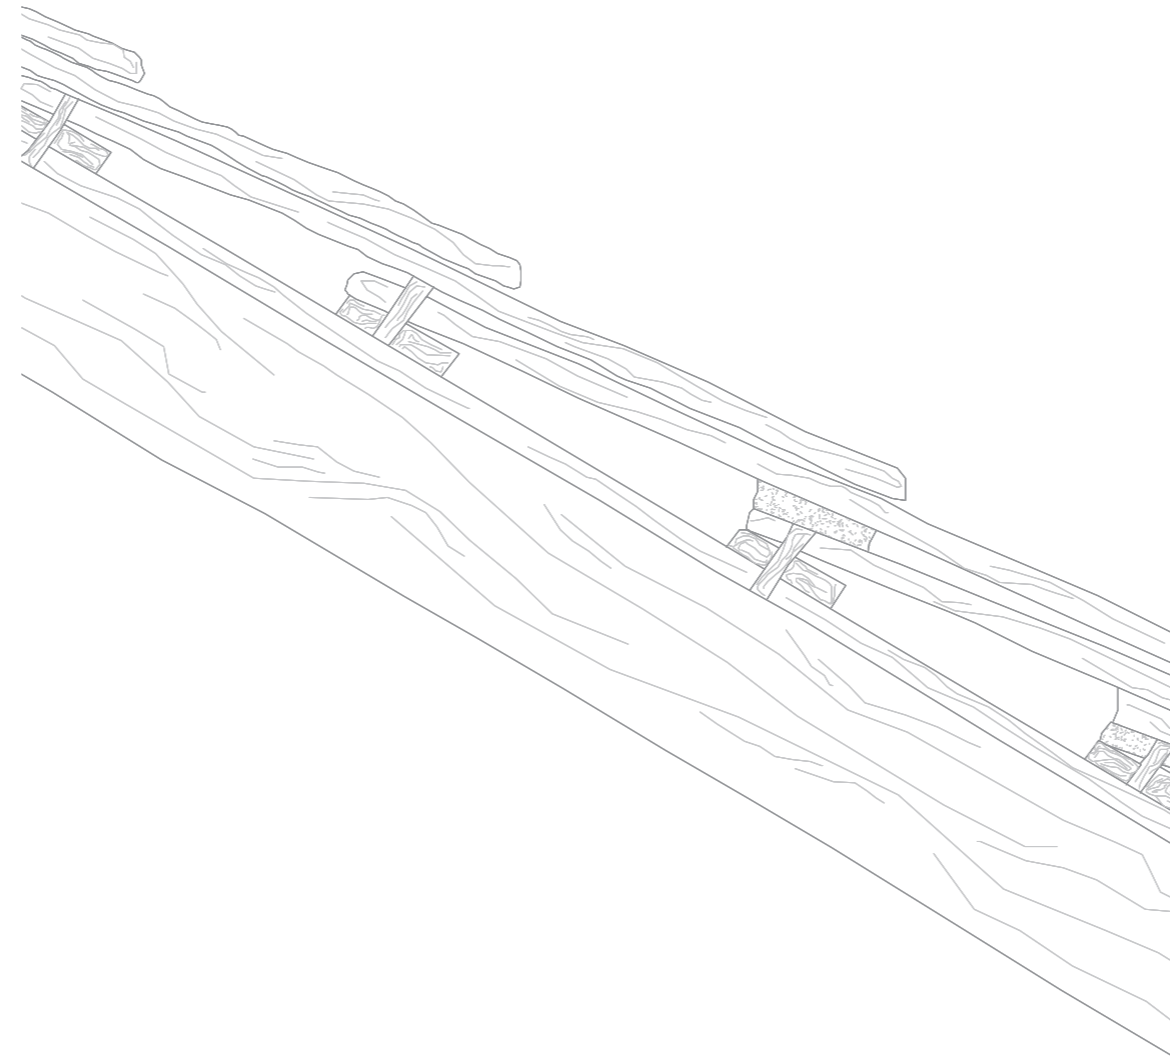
Wooden pegs to fix roof tiles to timber board below.
